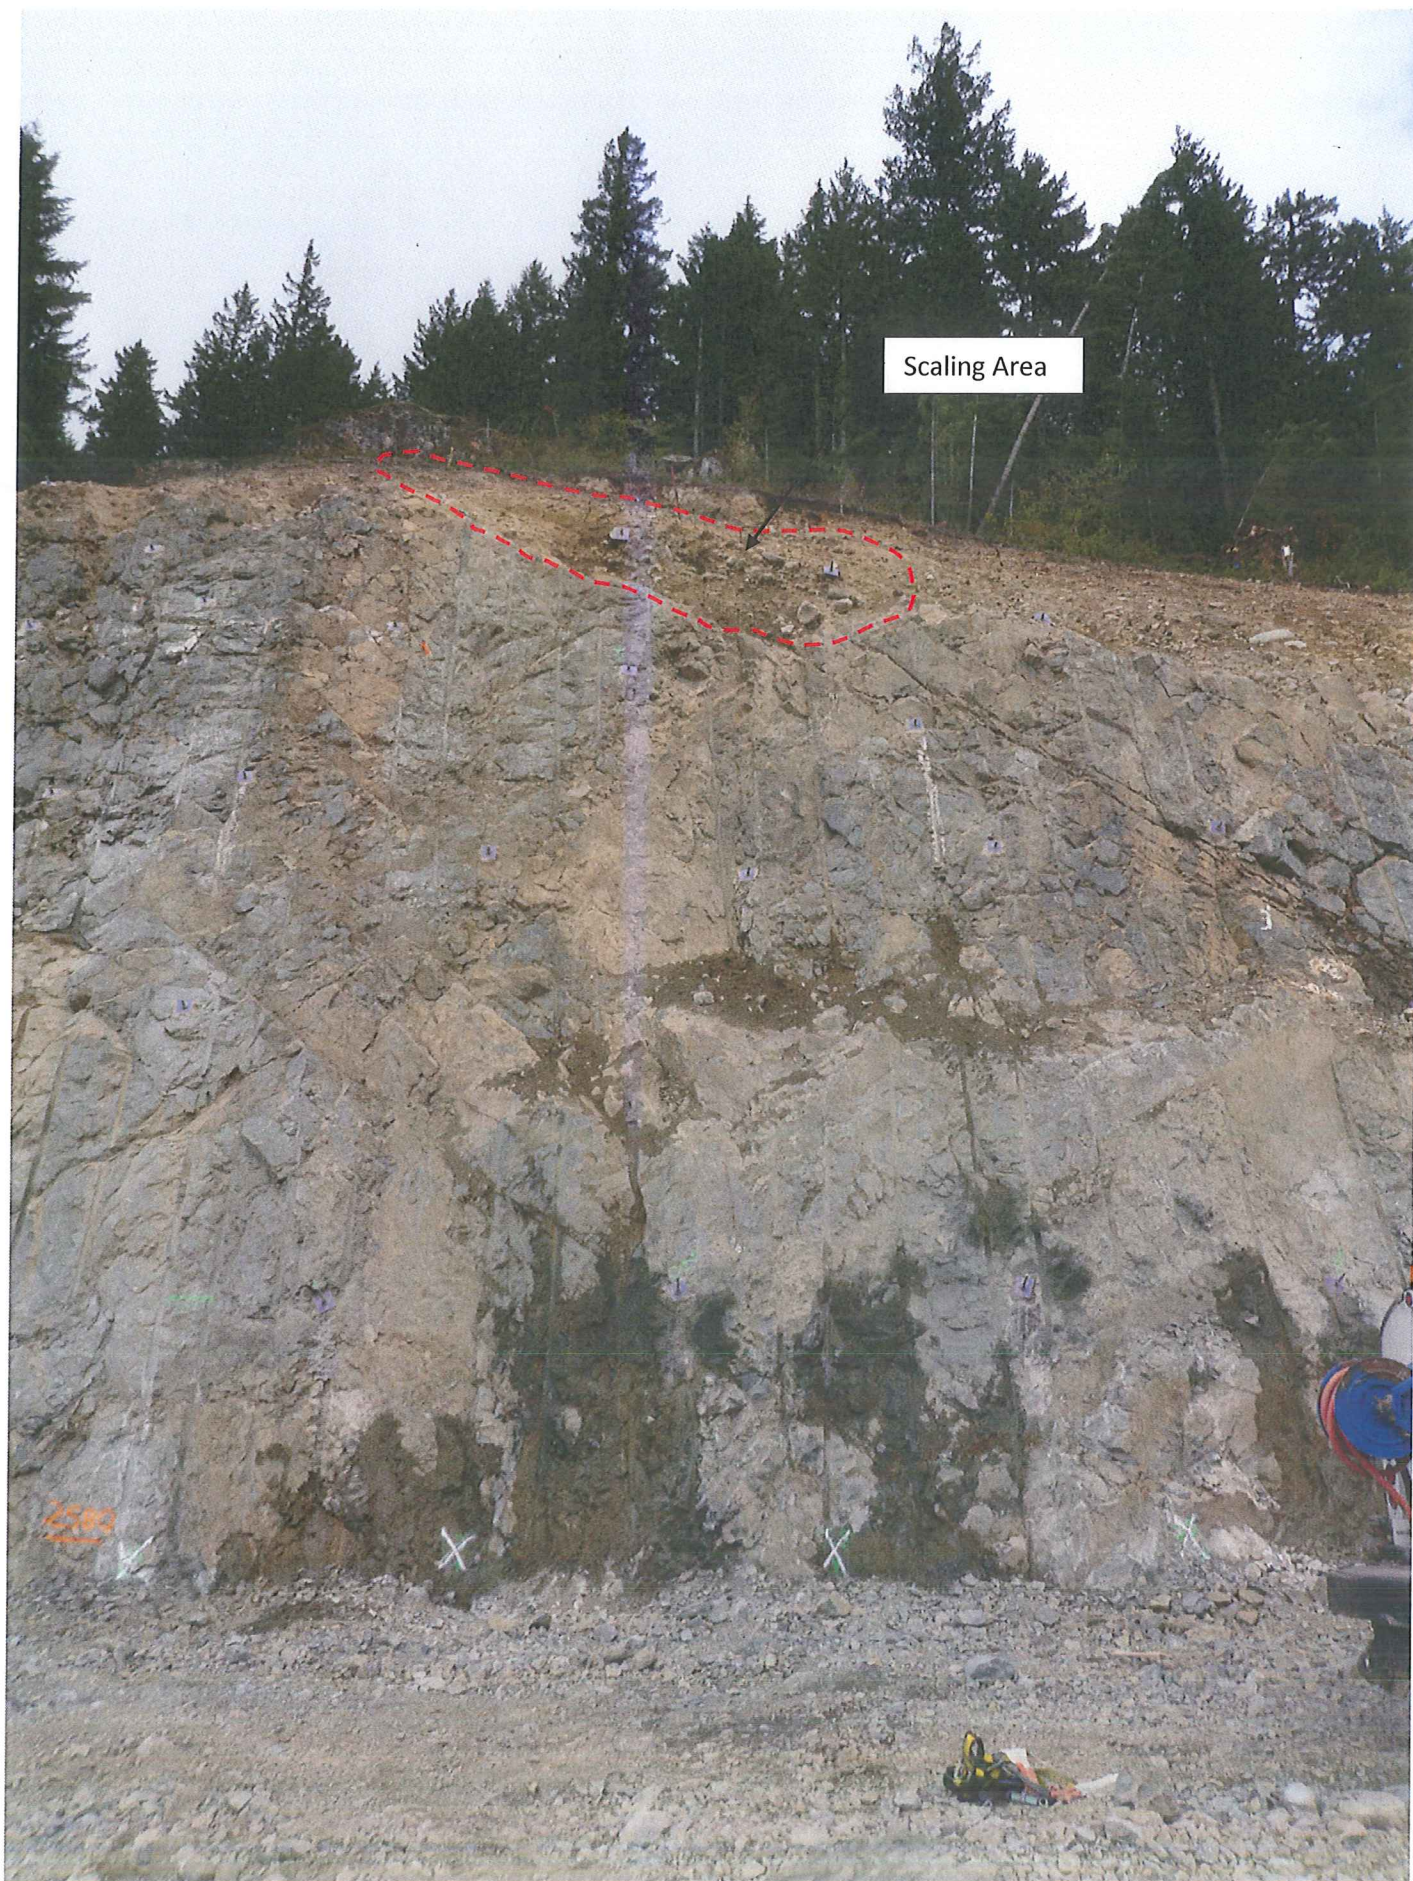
A photograph showing a scaling area located at the crest of the slope around station 1328+75.
